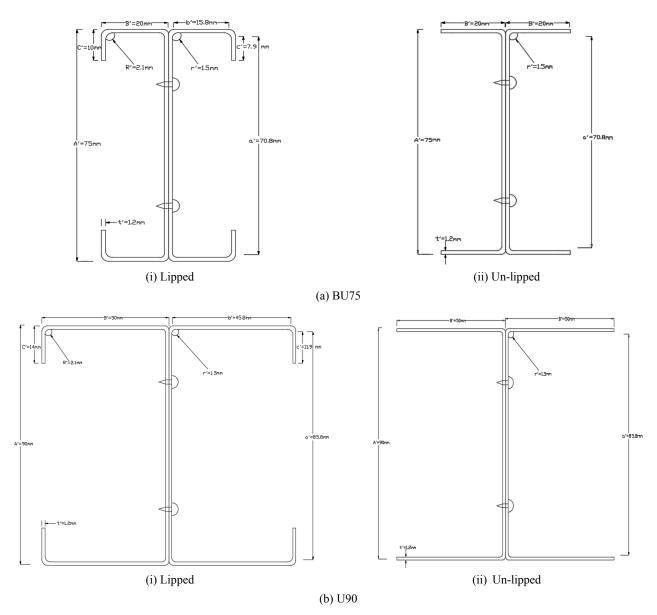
Details of back-to-back built-up cold-formed steel channel-sections
